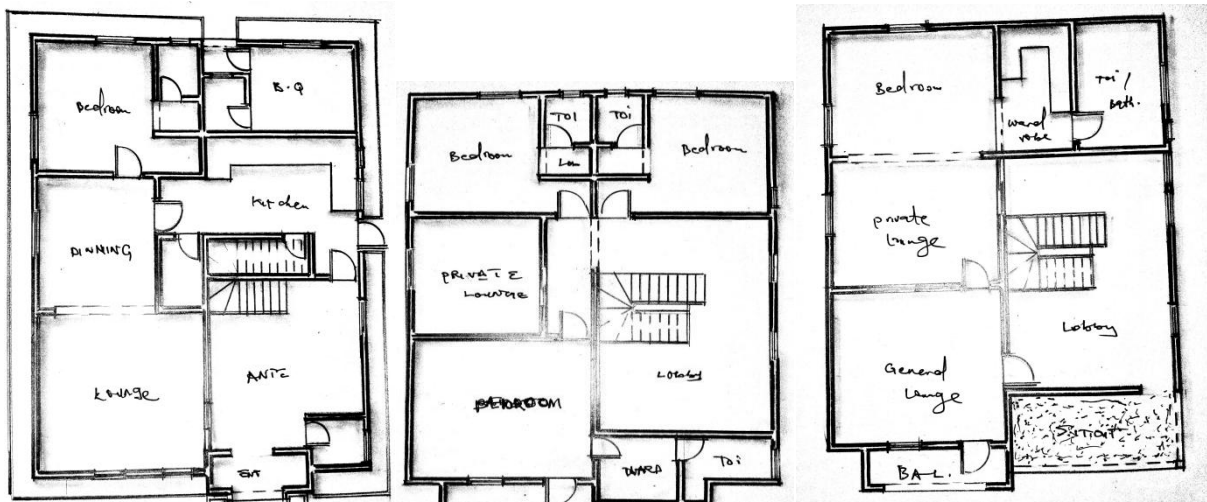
floorplan of Case Study one at cosgrove Abuja 4 Bedroom Duplex
